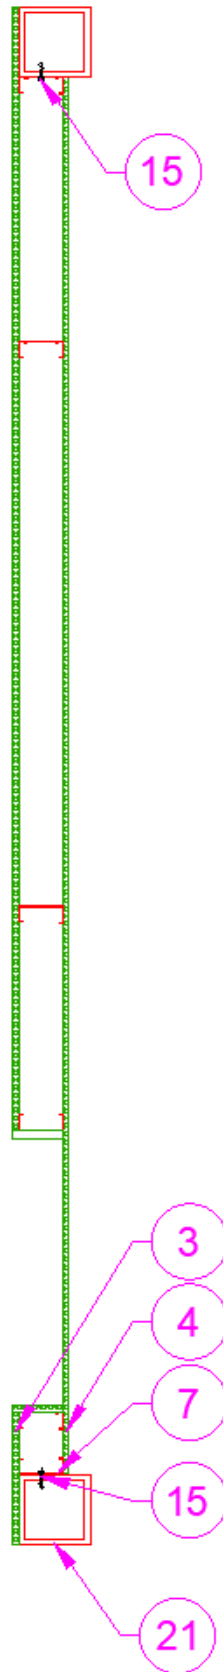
Cross section J-J – steel frame to false slab fixing detail
